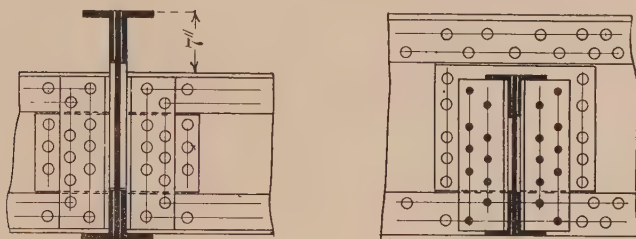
Type of connection of stringers to floor-beams used where floor must be shallow.
